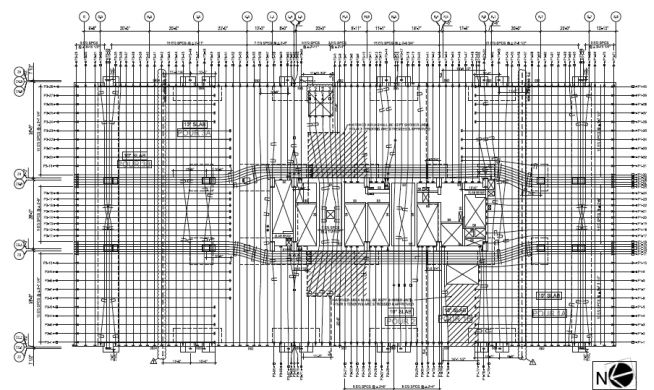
PT layout for Level 17 showing PT beams and girders. Image Credit: CCL USA, Inc.
